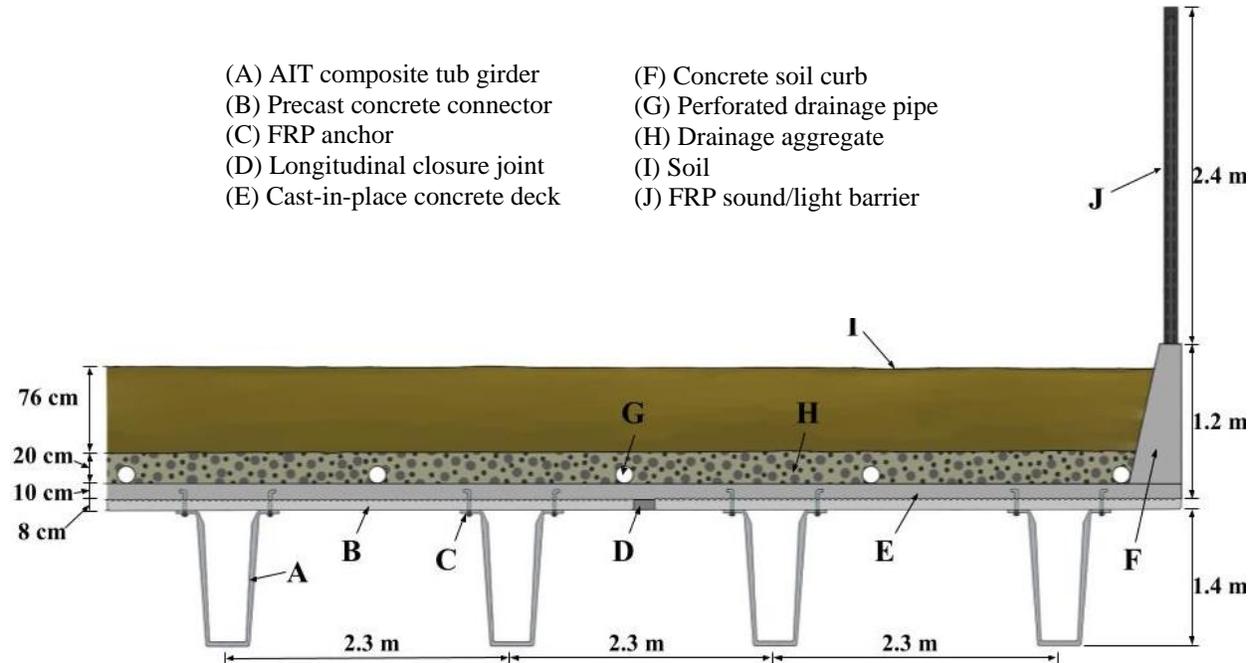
Cross section of the wildlife overpass showing the layout of the girders, concrete deck, soil, drainage, and barriers on the bridge span.
